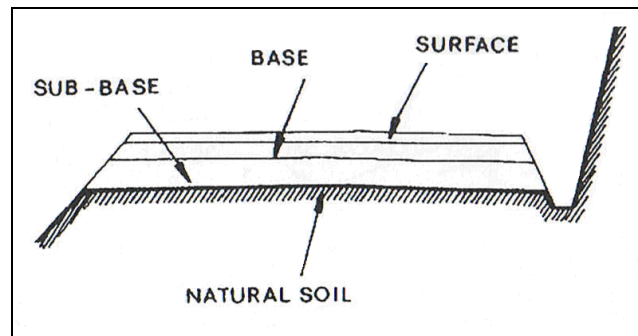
Typical design of a public low-volume road (Sessions, 2007)
